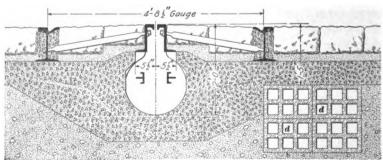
shows a section through one of the handhole vokes and illustrates the method of supporting the conductor rails. The conduit between vokes is made of concrete filled in around a sheet-iron form that is afterwards removed. The conduit may be lined with steel plates or may be constructed of concrete alone. Each manhole connects to the sewer through a 6-inch drain pipe. The outgoing and return feeders are run in terra-cotta ducts d, Fig. 74. To facilitate the installation of new feeders or the repair of old ones, duct manholes are provided every 400 feet. The vokes are designed to stand the pressure of the earth (packed down by the heavy traffic) and also the pressure due to freezing of the soil in cold climates. Cast-iron, steel, and wrought iron have been used, but cast iron is the most common. Light-weight vokes gave much trouble from breakage, so castings weighing from 200 to 400 pounds have been adopted. In some cases, the metal yokes have been replaced with concrete, but the best construction calls for the heavy metal yokes.
